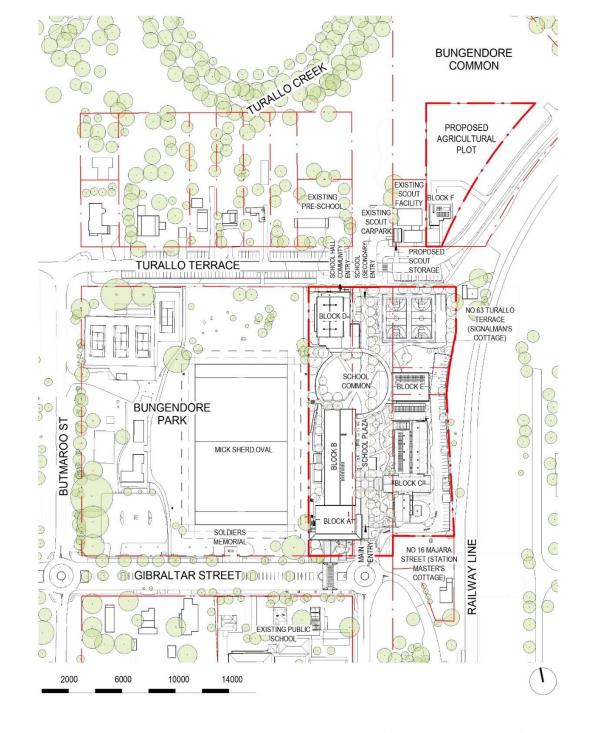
Site aerial depicting the land subject to the proposed High School (Source: TKD Architects)
